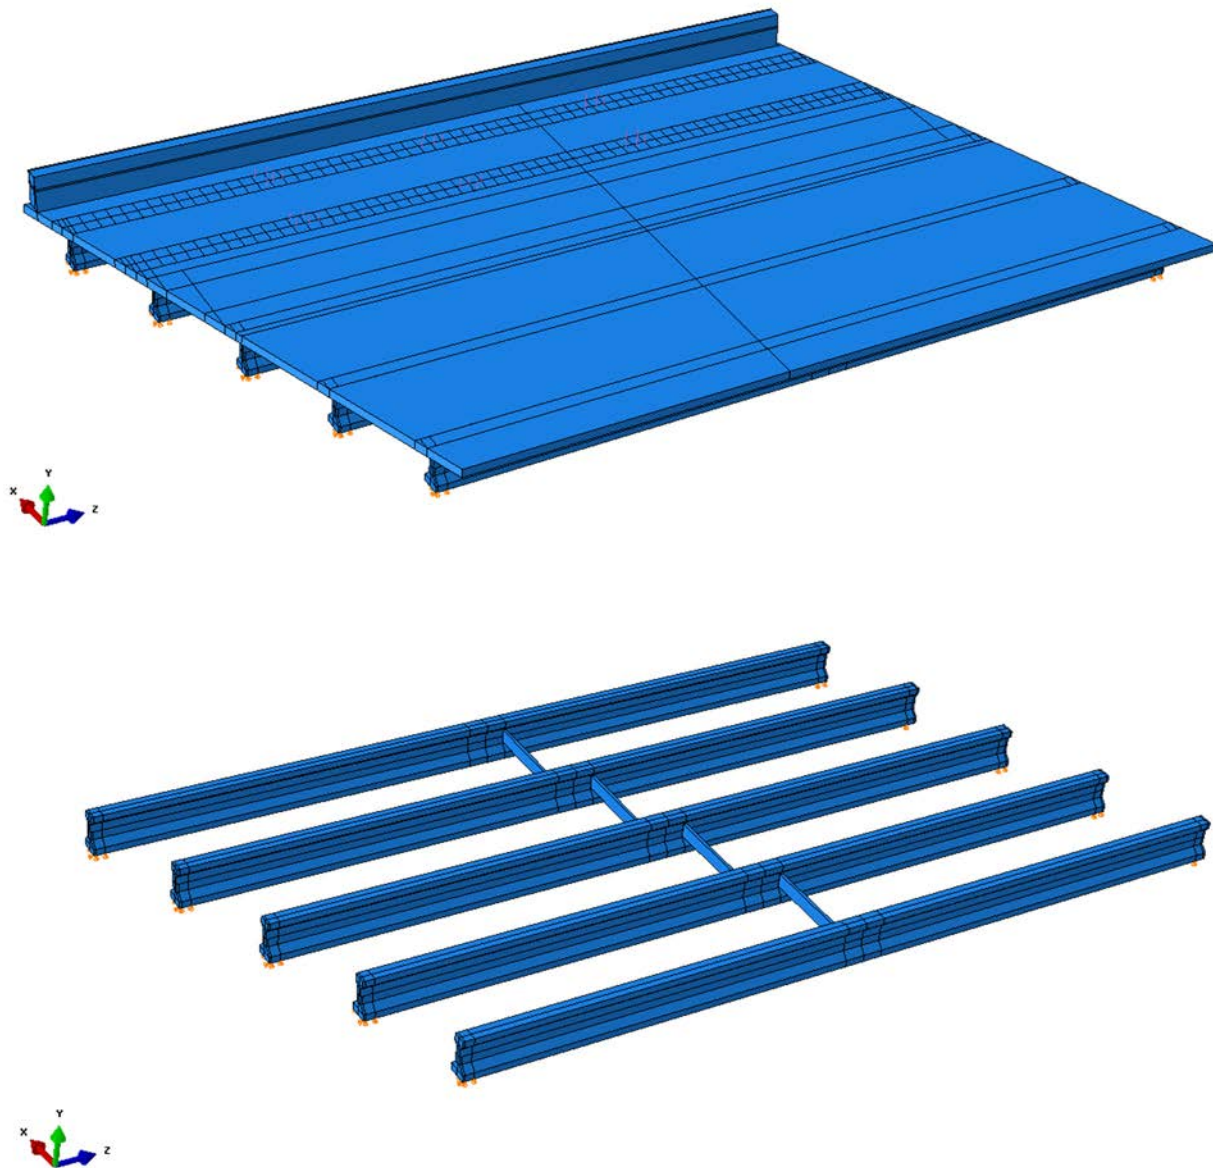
Top: Isometric view of finite element model for B-16-136. Bottom: Concrete deck hidden to show bridge framing and boundary conditions.
